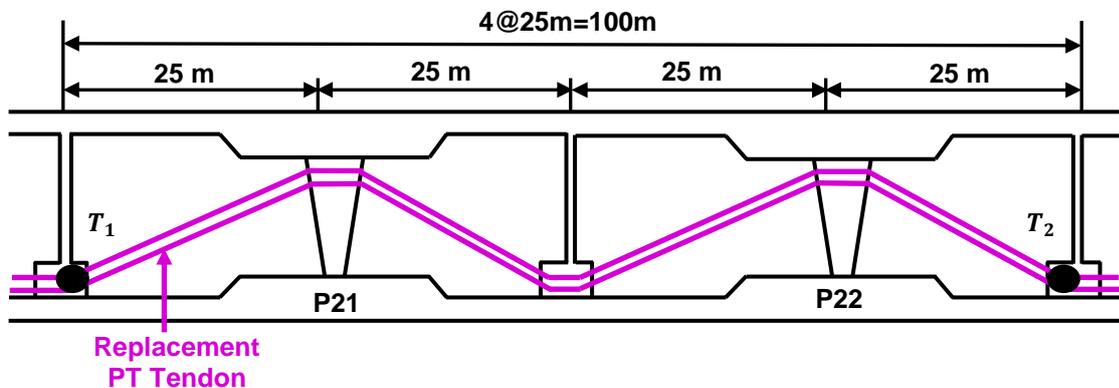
A side cross-section view of the Jeongleungcheon Bridge P21-P22 girder
